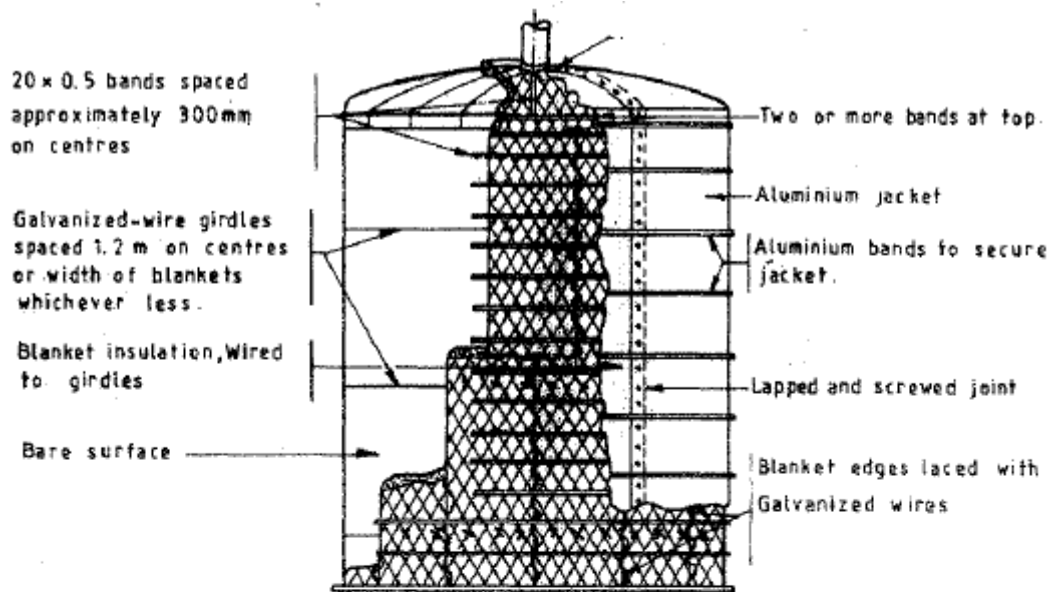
Application of mineral wool blanket insulation for tanks 3 m dia and above.
